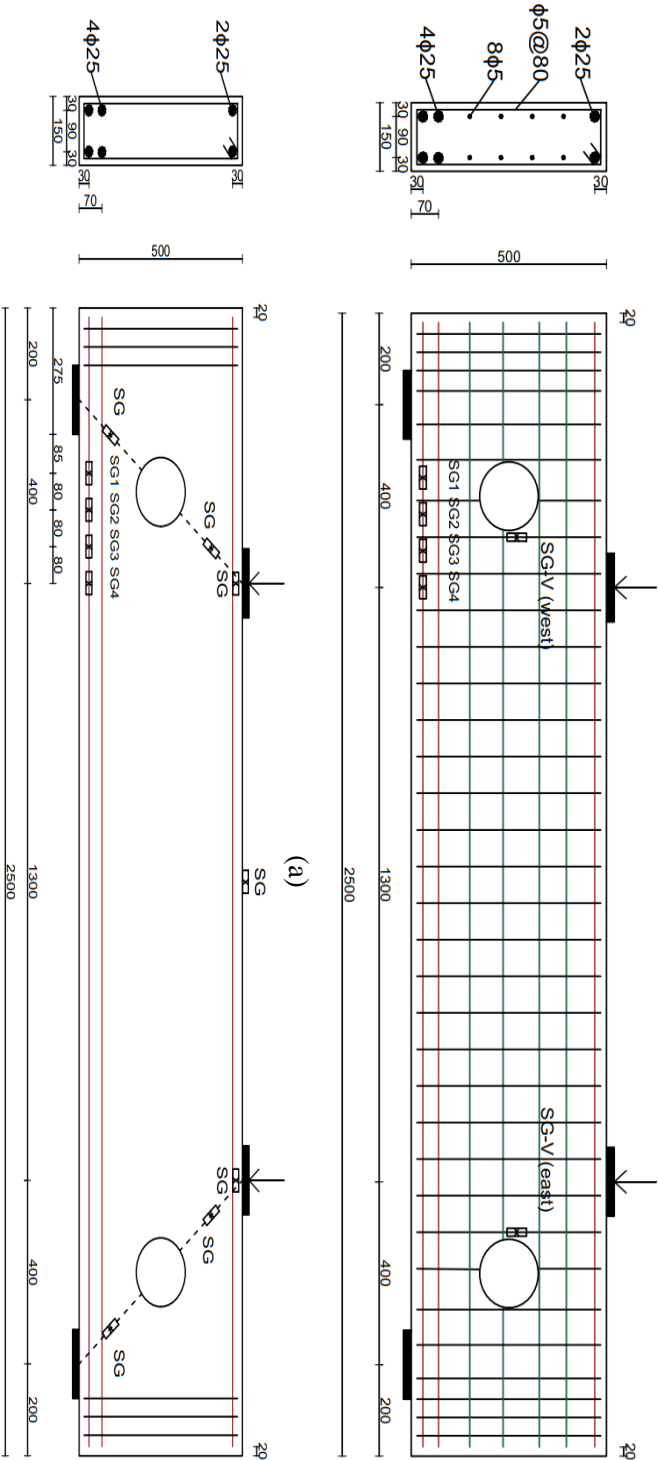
Details of deep beam specimens (dimensions are in mm): (a) A beam with conventional steel stirrups; (b) a beam without conventional steel stirrups
